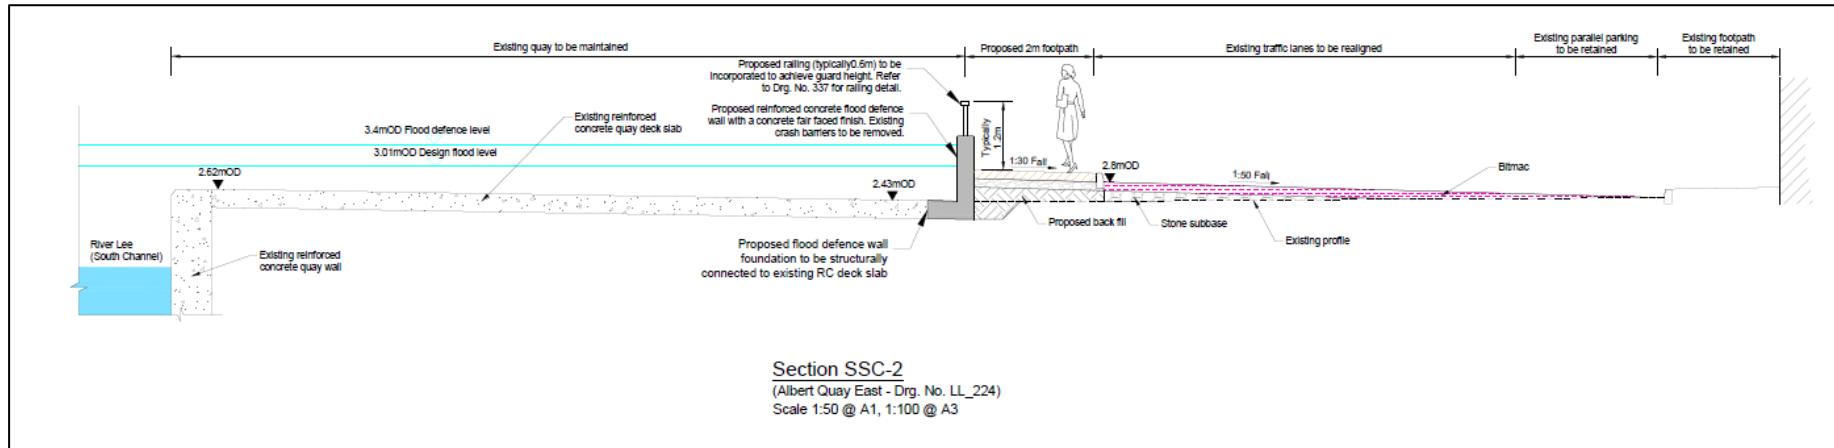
Lower Lee (Cork City) drainage scheme cross section SSC-2
